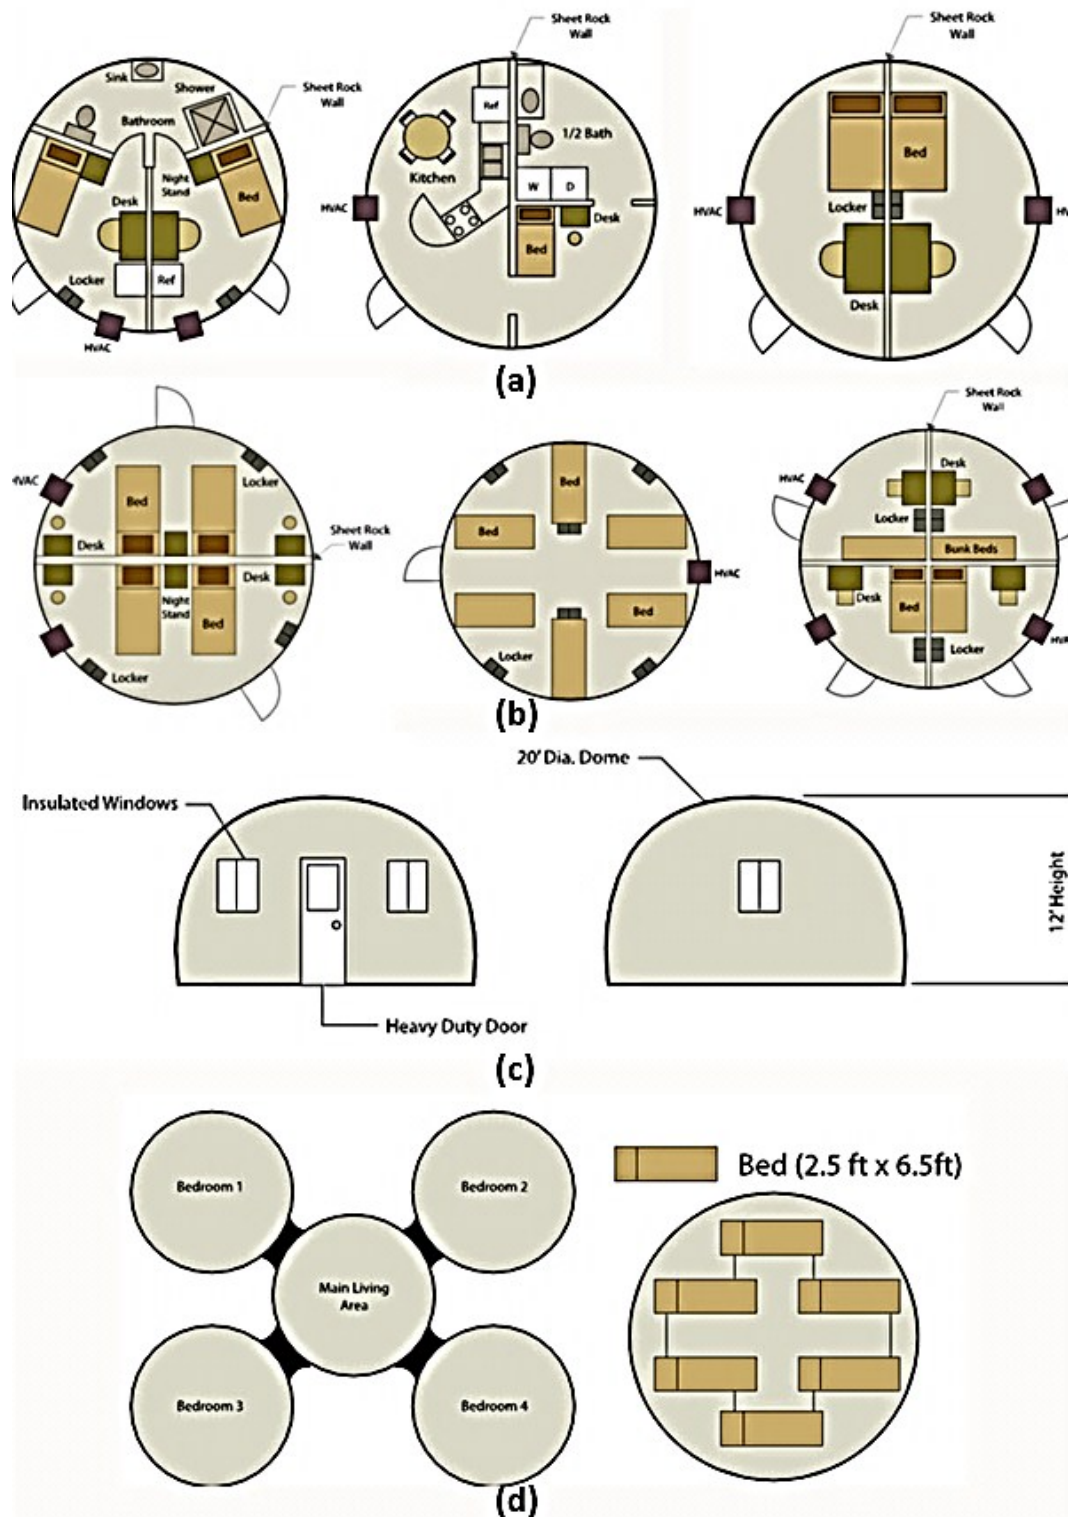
Floor layout of dome village: (a) 2-person layout plan of dome village, (b) 4-person layout – 6-person layout plan of dome village, (c) Elevation of dome village, (d) Cluster Layout of dome village, (<http://www.intershelter.com/uses>).
